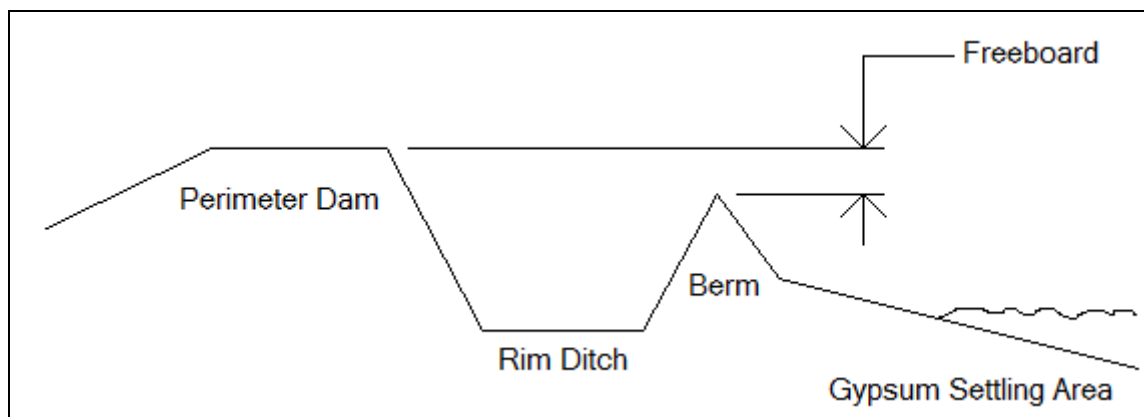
Cross section of perimeter dam and rim ditch (Ando, 1994).
